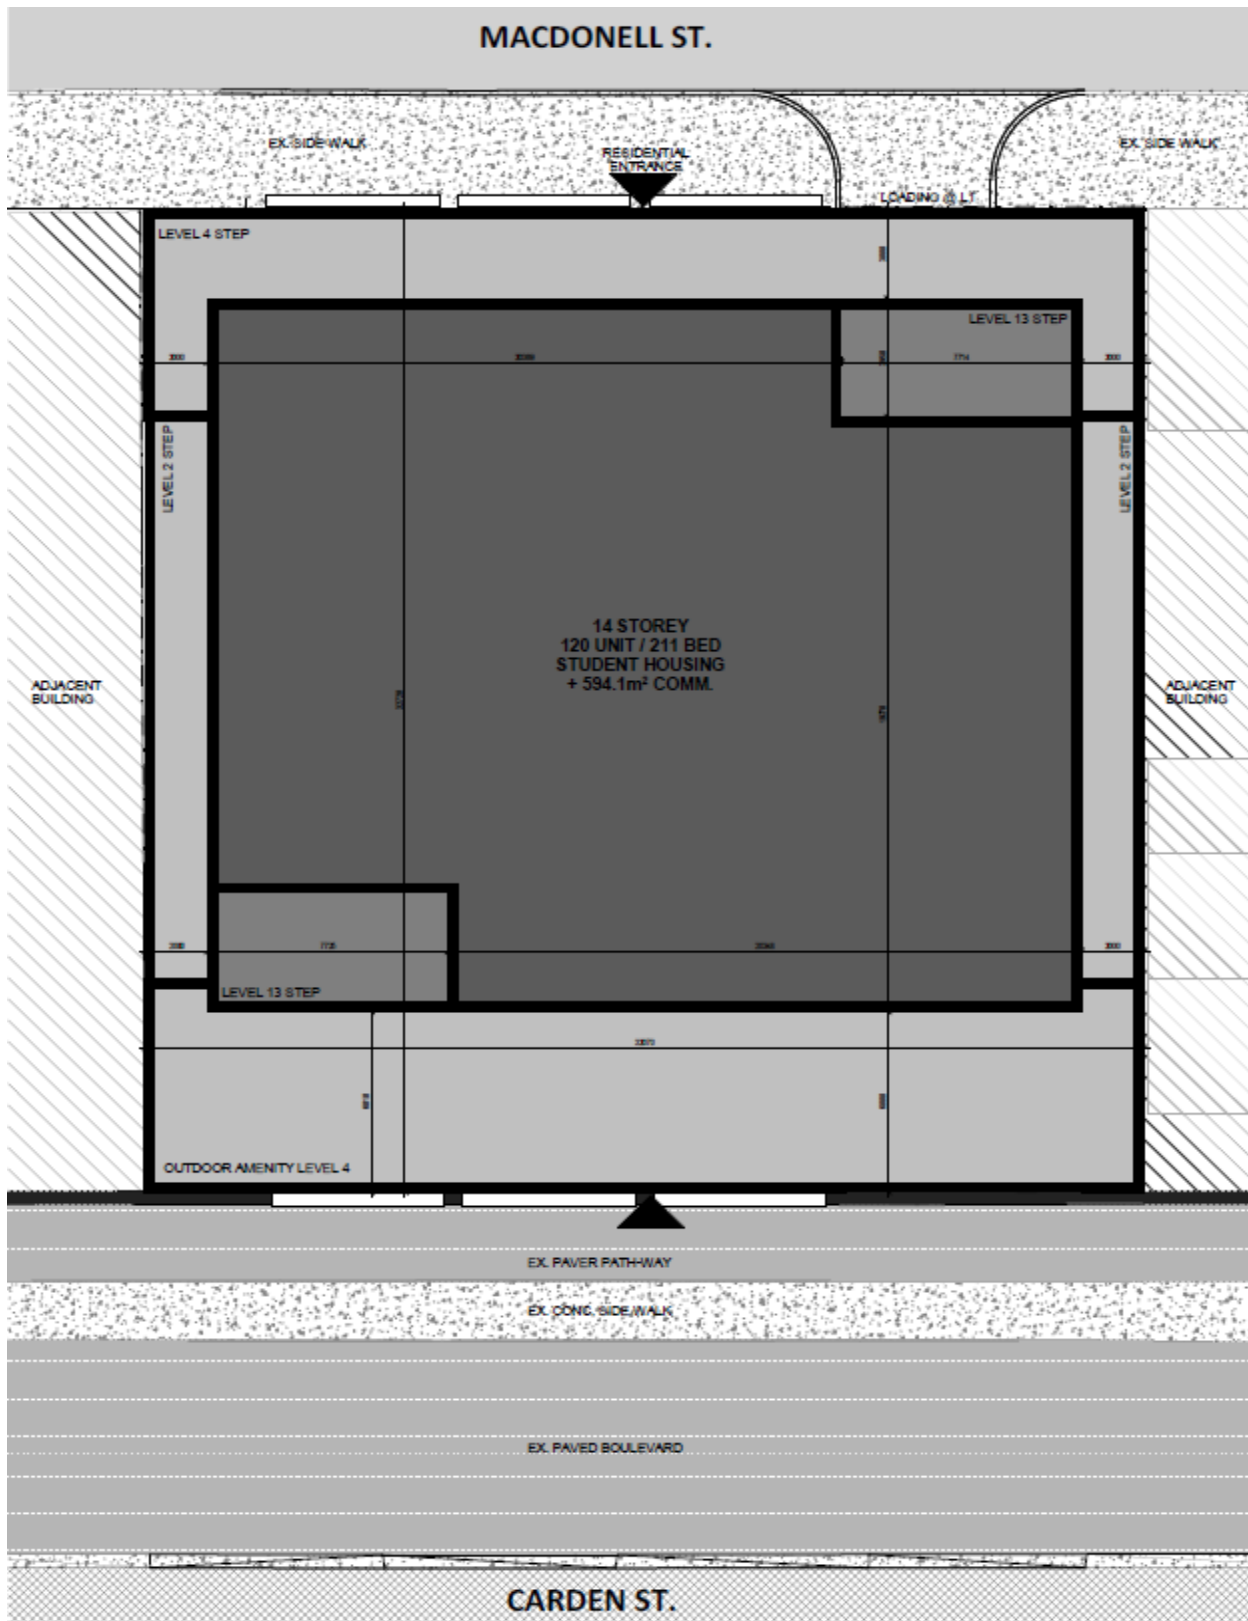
shows the proposed site plan for the development which was prepared by SRM architects, which contemplates a three storey podium extending to front, rear and interior side yards. As shown on the plan, the development will front onto both Carden Street and MacDonell Street as the property is a through lot. The site plan shows the position of the tower which has been positioned 6 m from the Carden Street front façade of the podium, and 3 m from the MacDonell Street podium façade.
